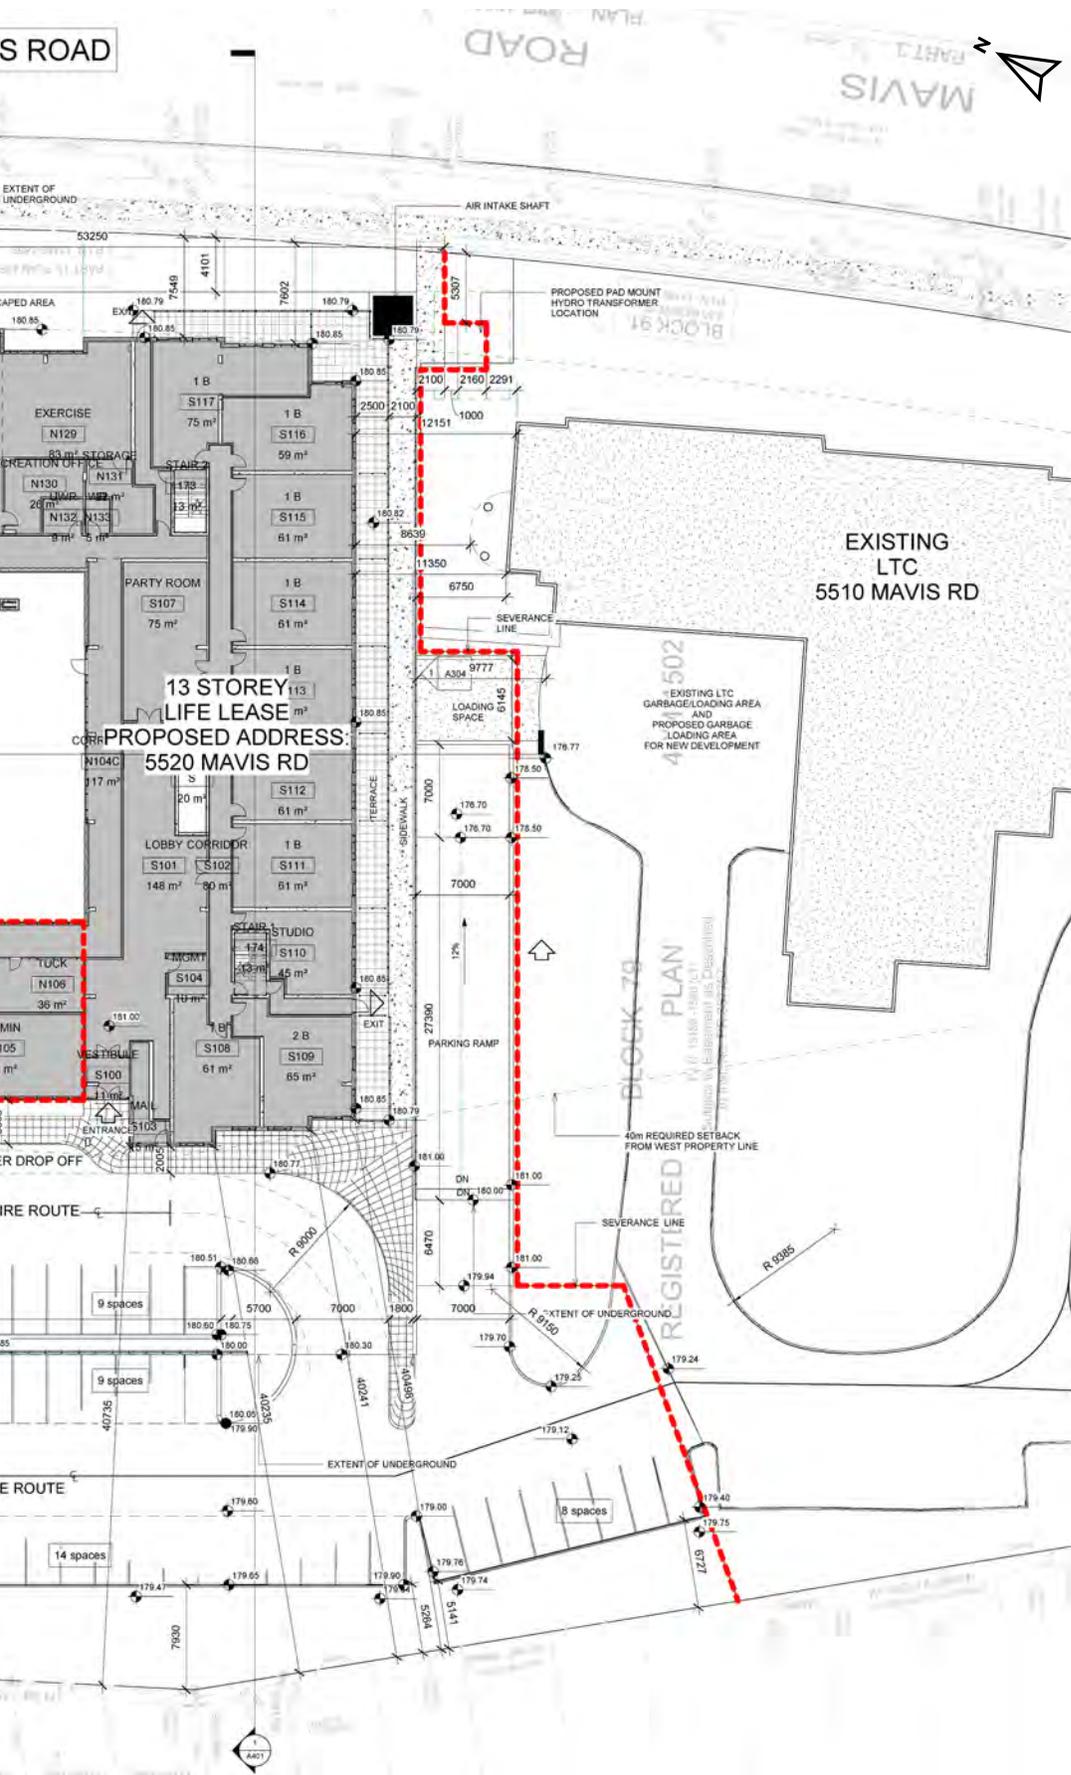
SITE PLAN OF PROPOSED DEVELOPMENT.
